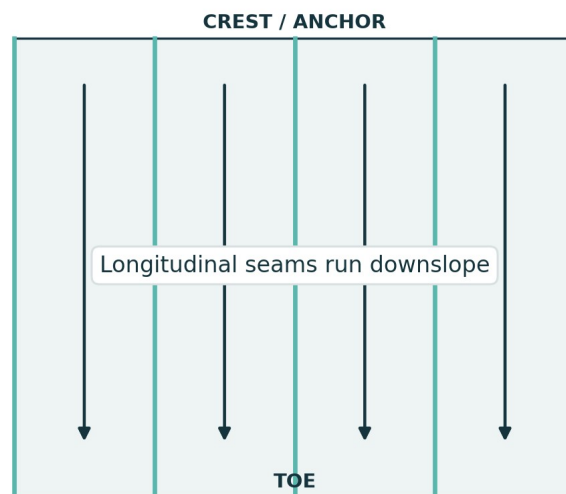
Slope installation principles: crest anchorage and seams running down the slope.
